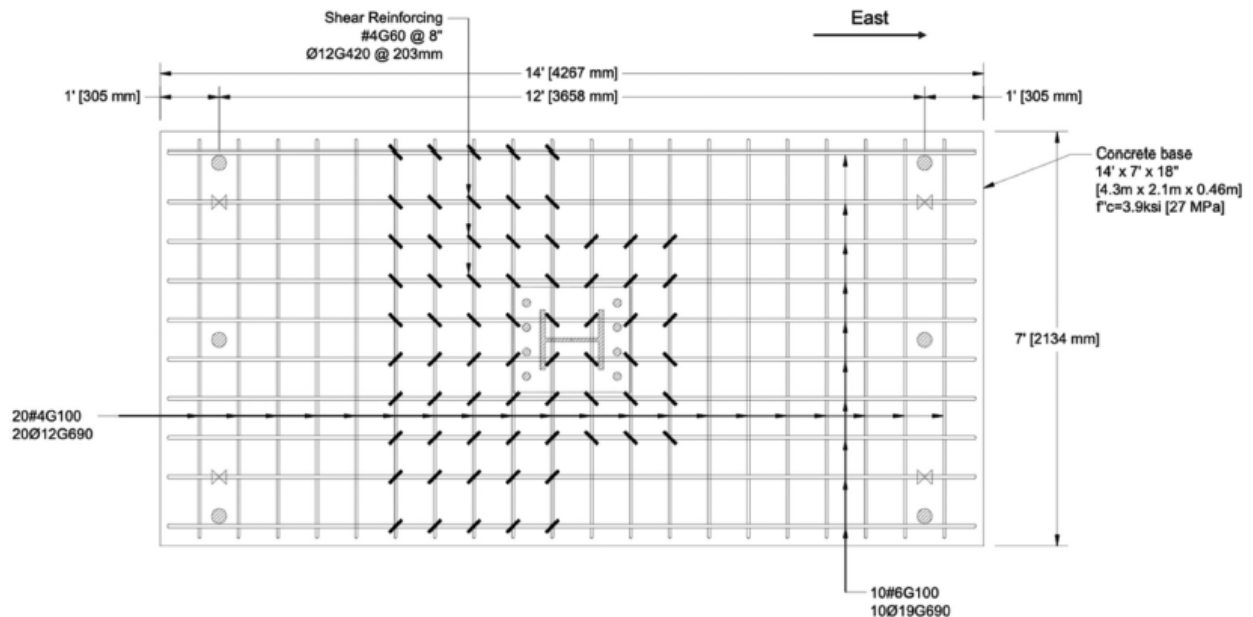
Plan view of specimen M02 (Worsfold et al. 2022)
